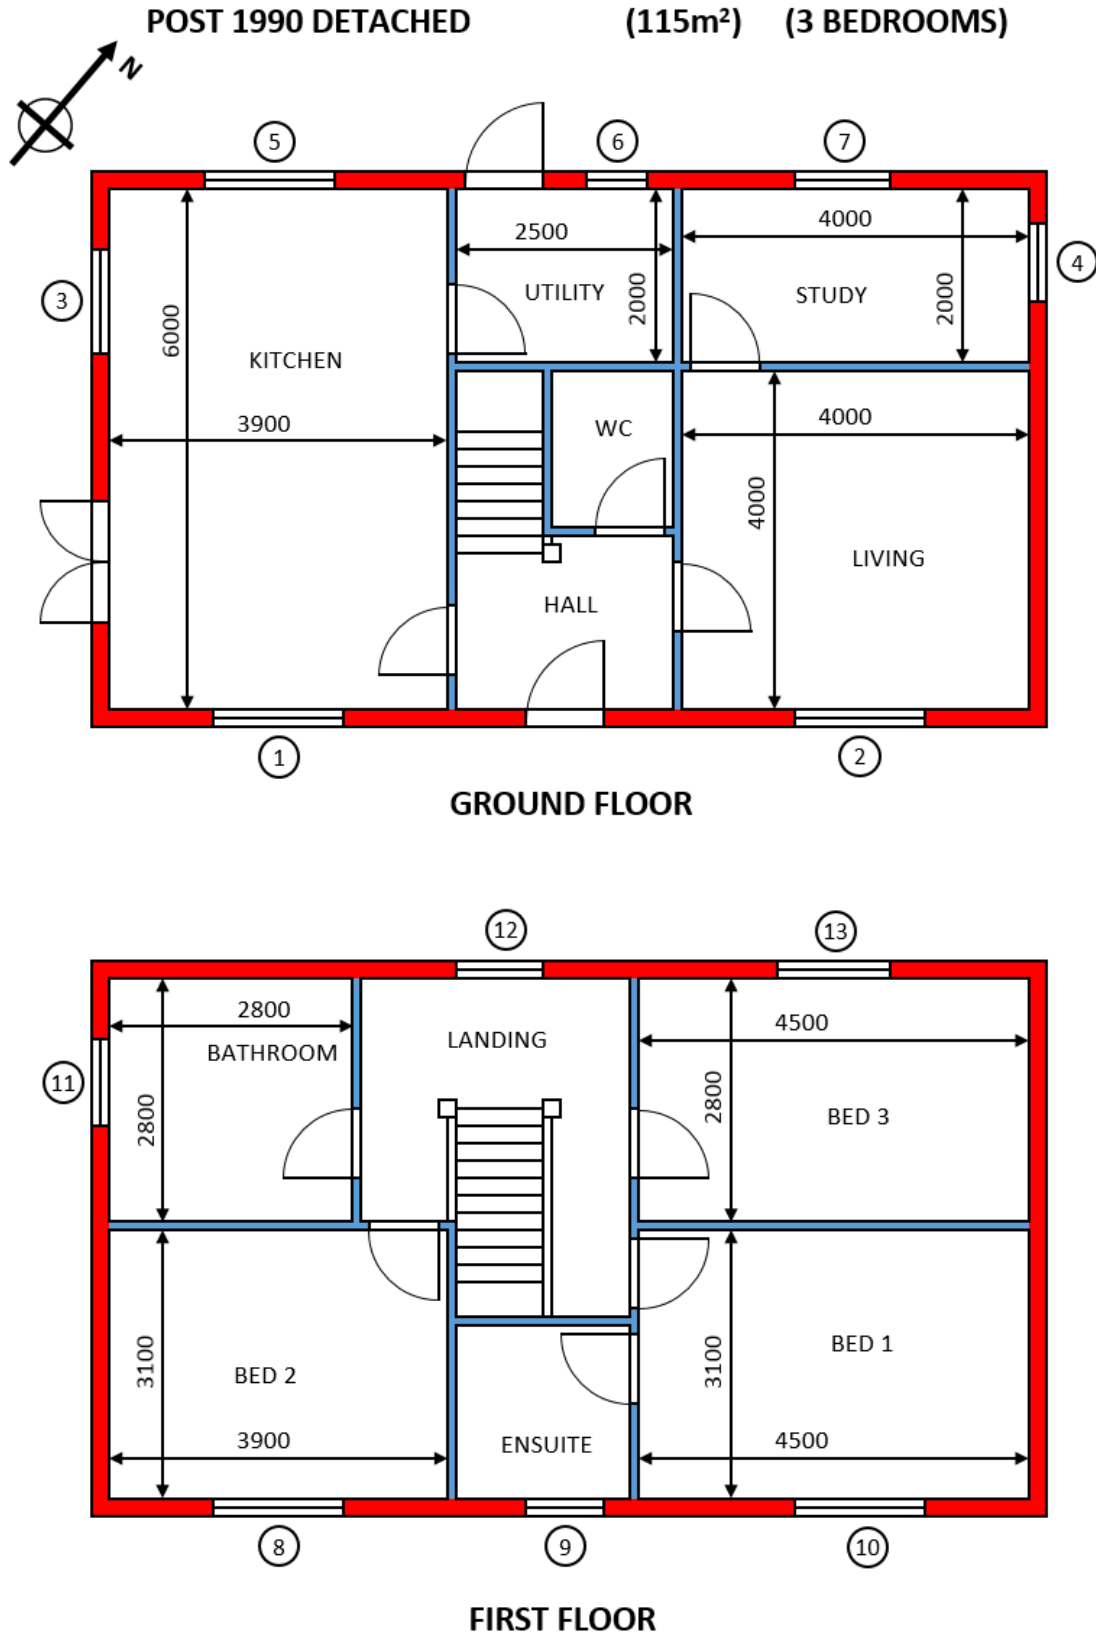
Post 1990 detached – building layout. Window references are numbers in circles; red walls are external and blue walls are internal.
